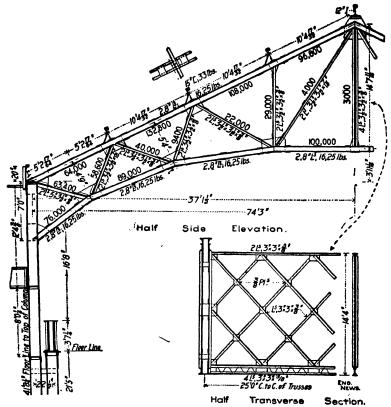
ROOF TRUSS AND TRANSVERSE BENT SHOWING TRANSVERSE BRACING.
